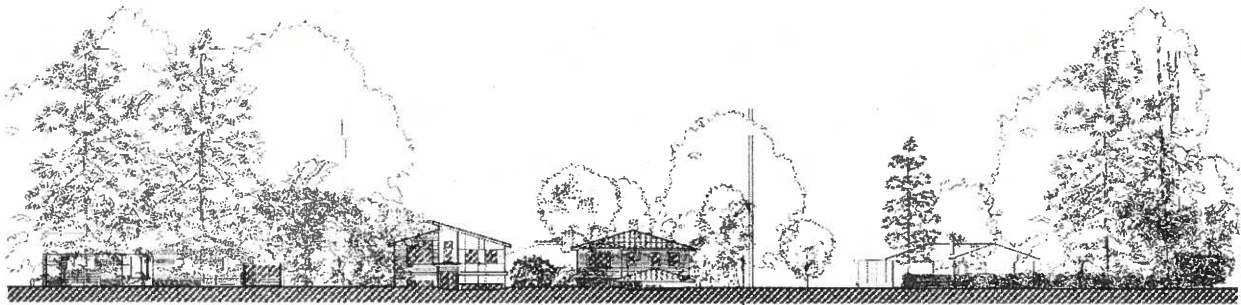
Streetscape Elevation Showing Proposed Dwellings (from plans prepared by Studio Ink)
